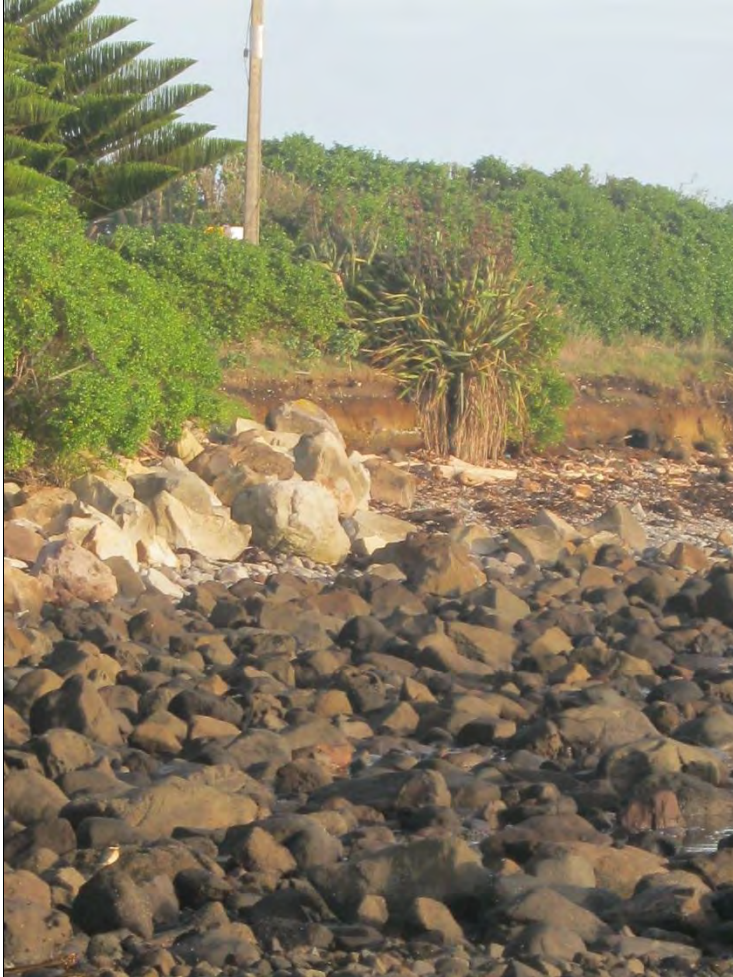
Erosion on the south side of the Bayly Road seawall, Cape Egmont (May 2014)
